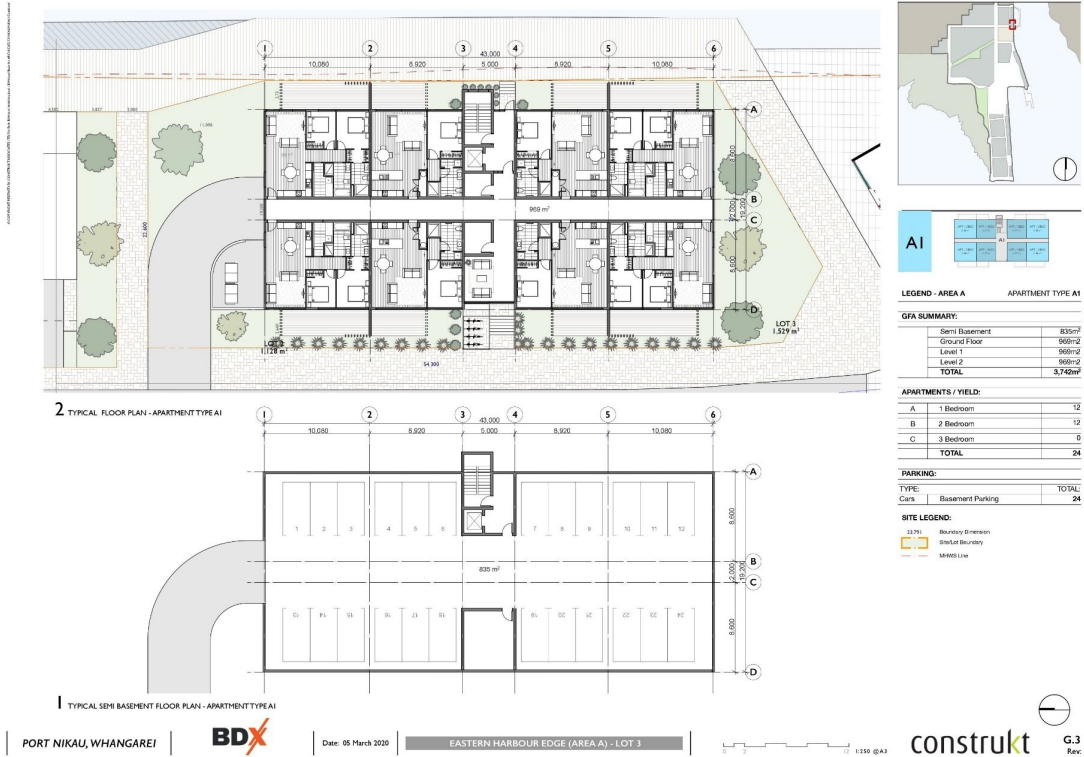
Part G – Eastern Harbour Edge (Area A) Floor Plans
